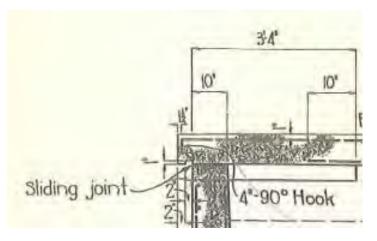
Sliding Joint Between Wall and Roof (Source: Section L-L on Sheet 8 of 1936 design drawings by Stevens & Koon)
